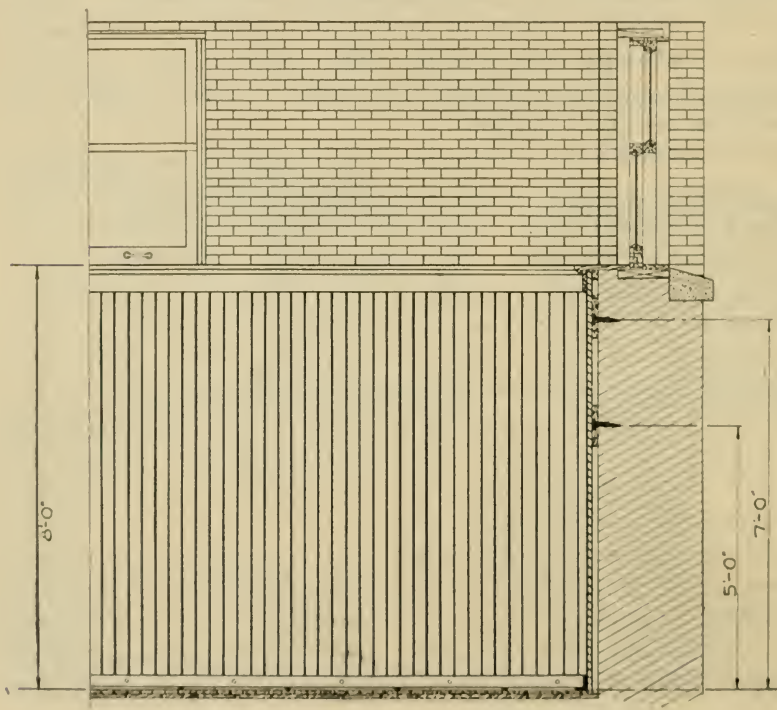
Wainscoted Walls. Special wall attachment is required to provide necessary strength. Note double floor construction and angle iron base.
